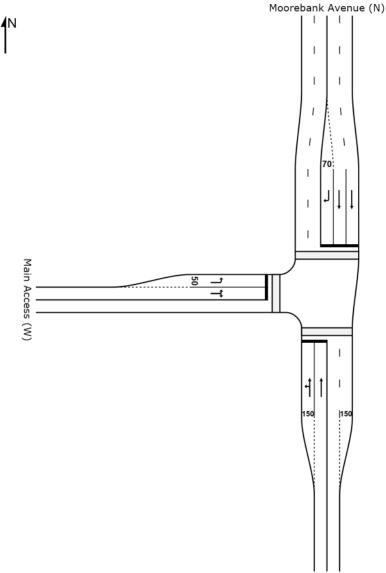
Proposed Moorebank Avenue and Warehouse Access 3 intersection
